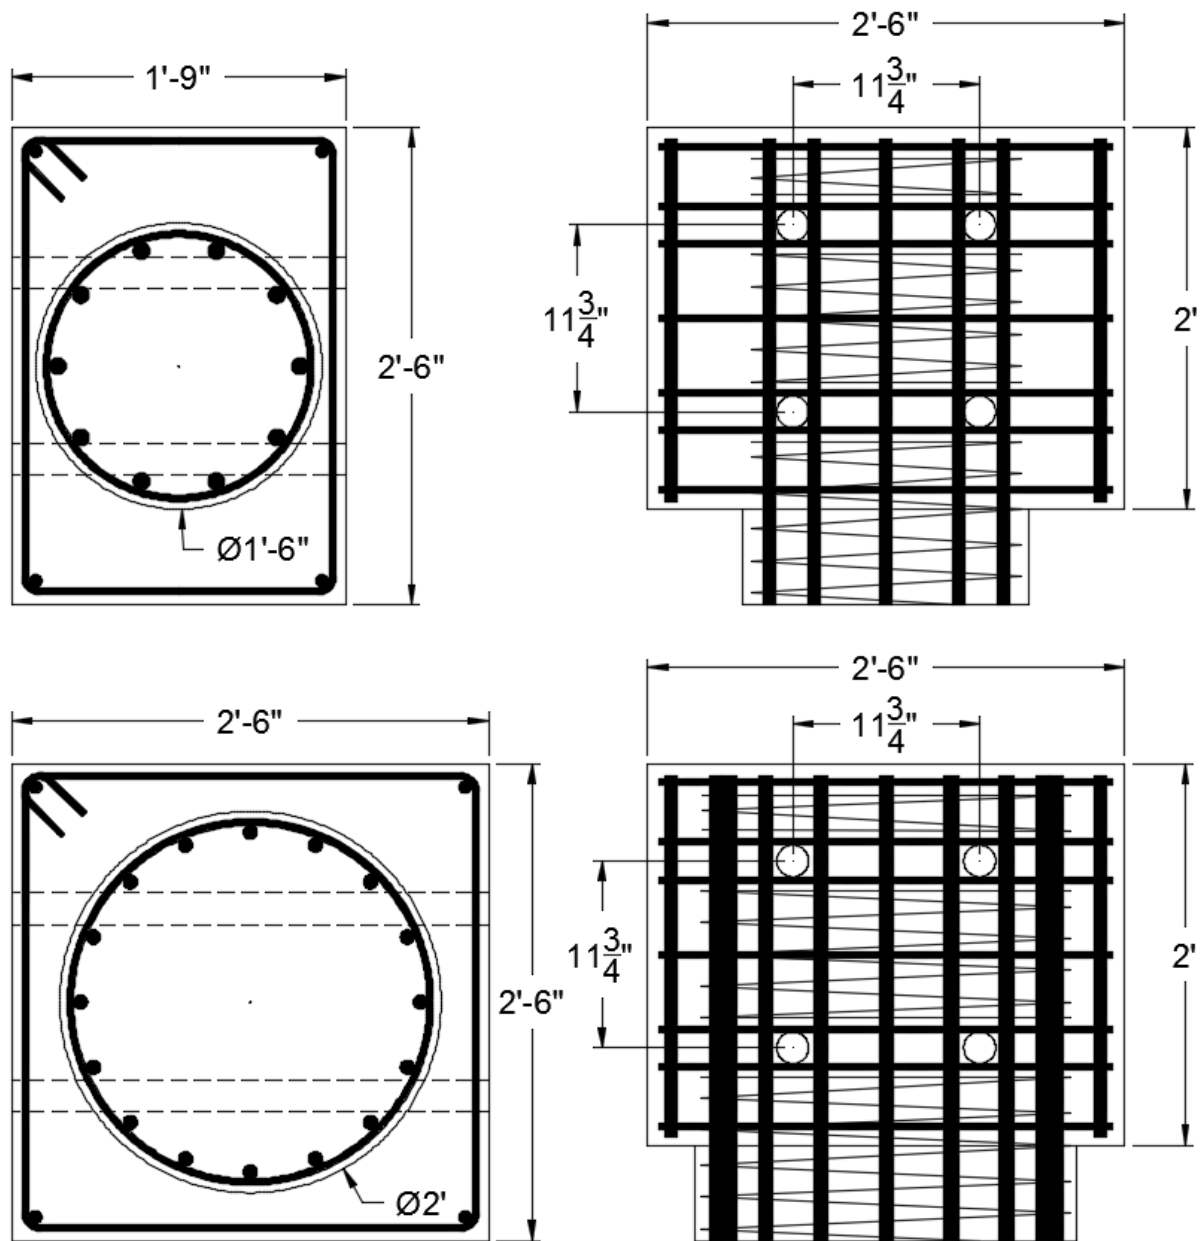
Column Cap Reinforcing Details for 18" and 24" Diameter Specimens
